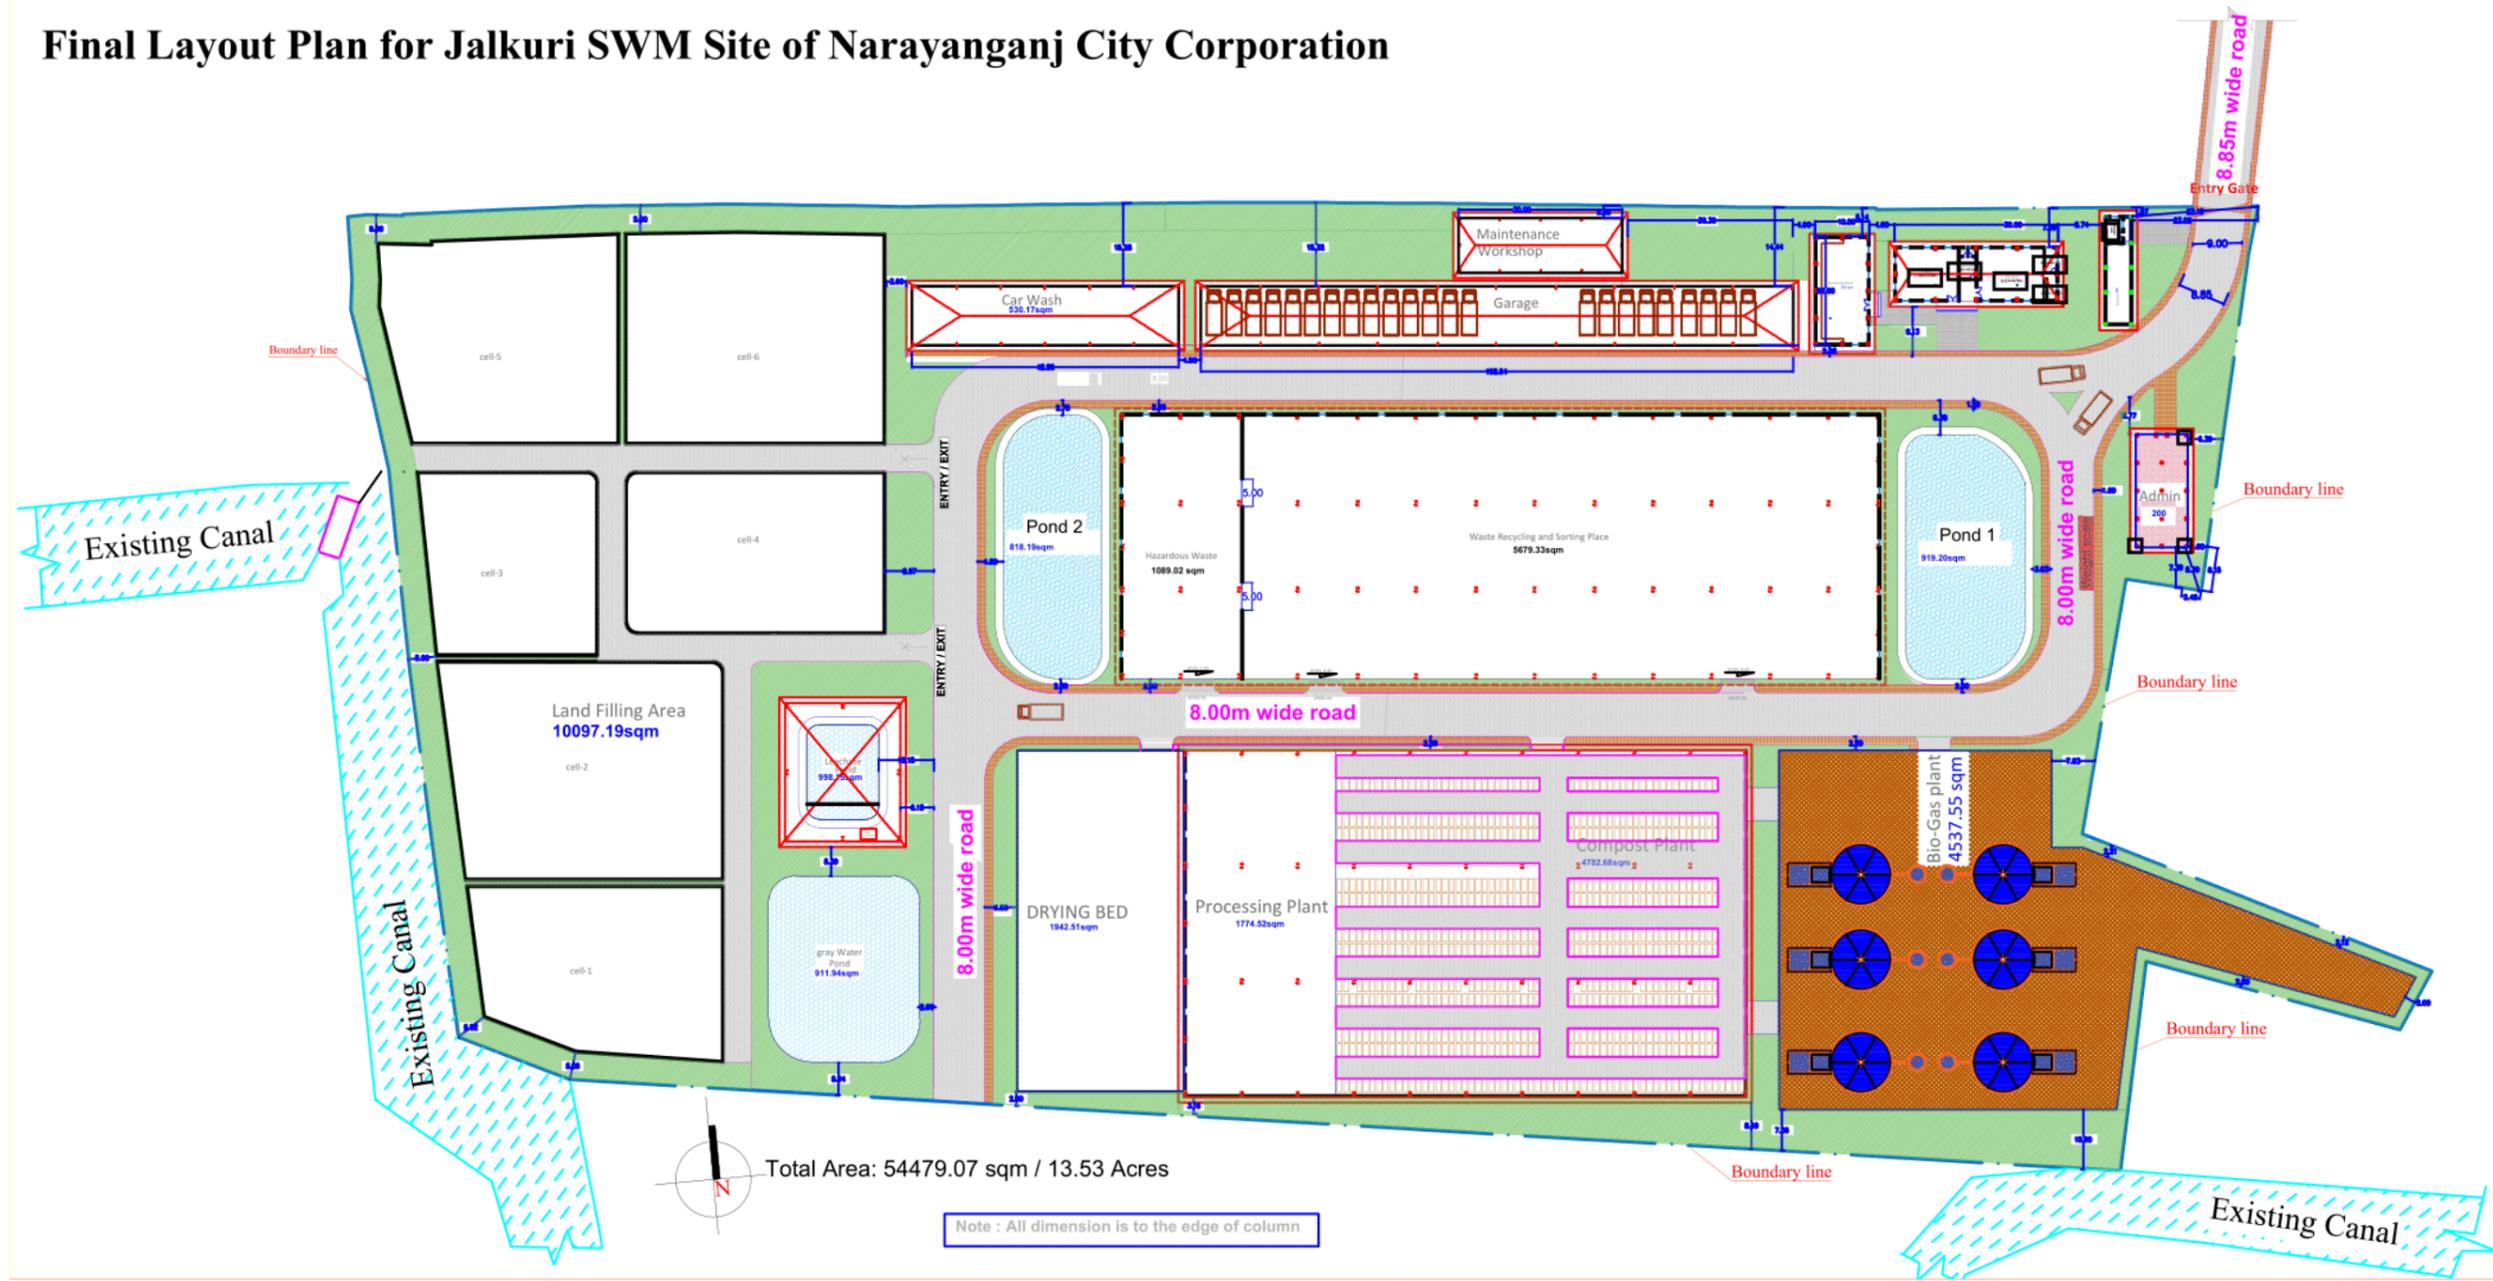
8: Layout Plan of Jalkuri Landfill Site
